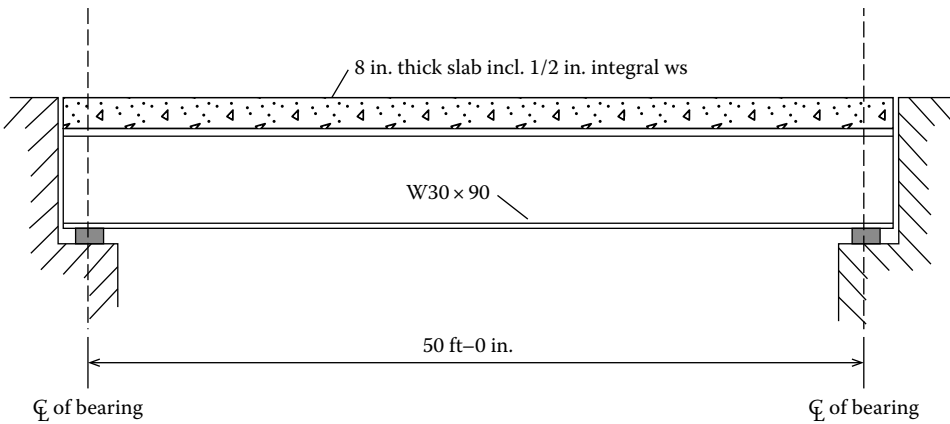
Design sketch of the composite steel girder bridge of Example 6.10.
